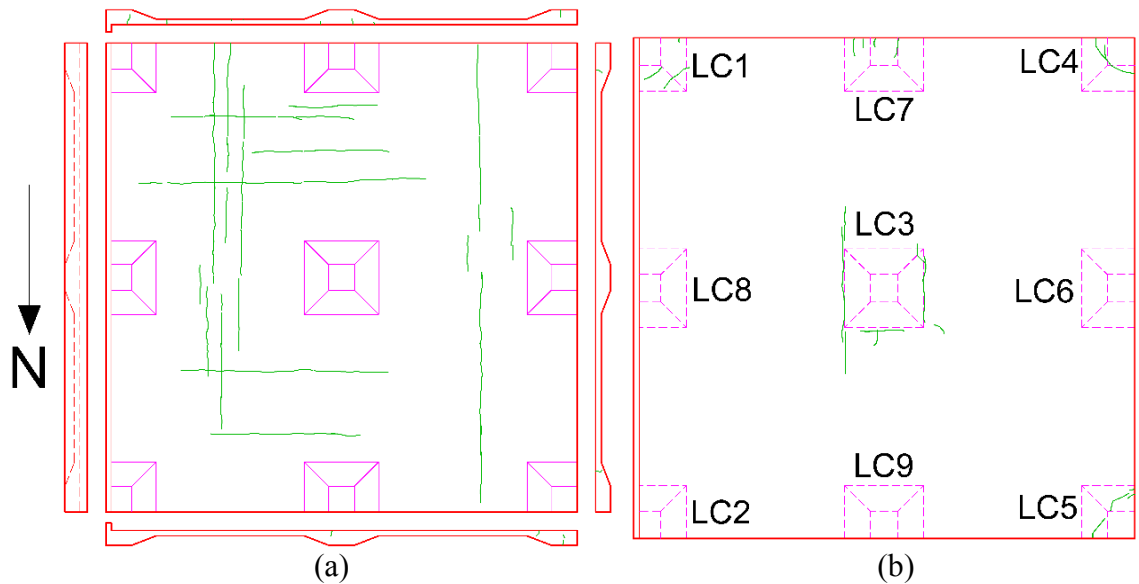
Cracking in the specimen 2 after uniform gravity load of 90 psf, (a) Bottom and sides of the specimen, (b) Top of the specimen.
